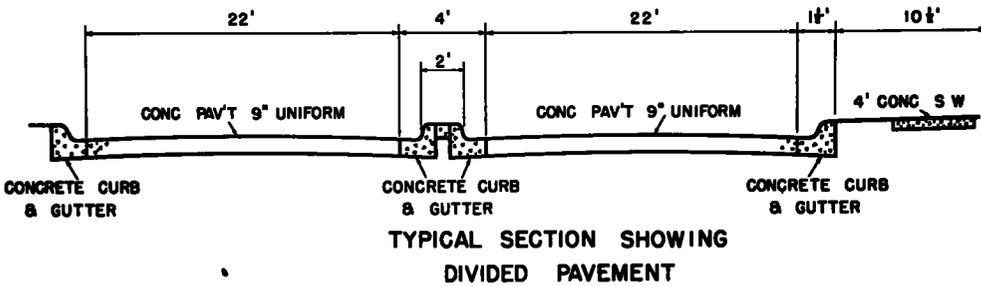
Typical Cross Section US 127 Cedar Street, Lansing
